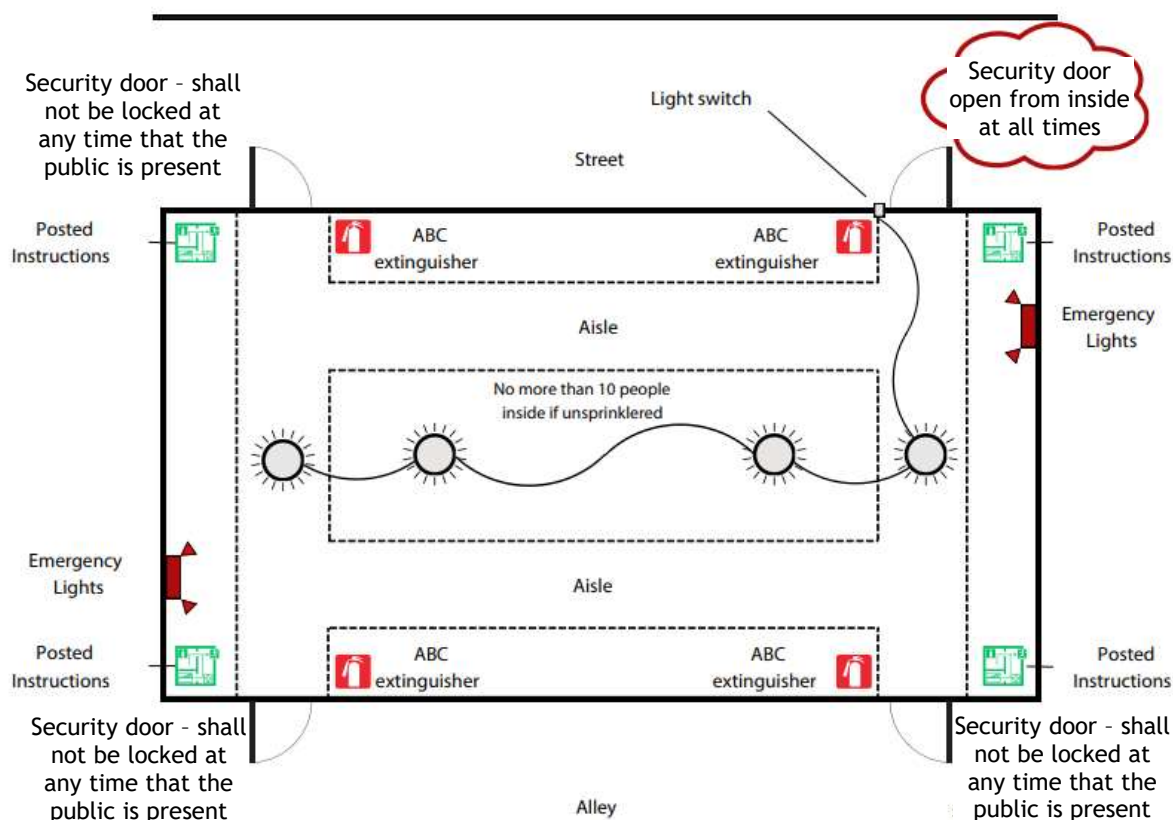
Sample Floor Plan Where Two Means of Egress Provided
